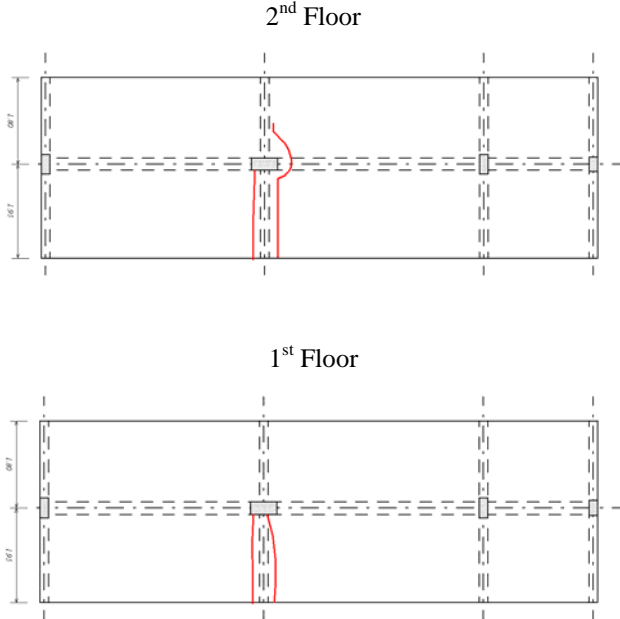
Slab damage pattern after the bare frame tests
